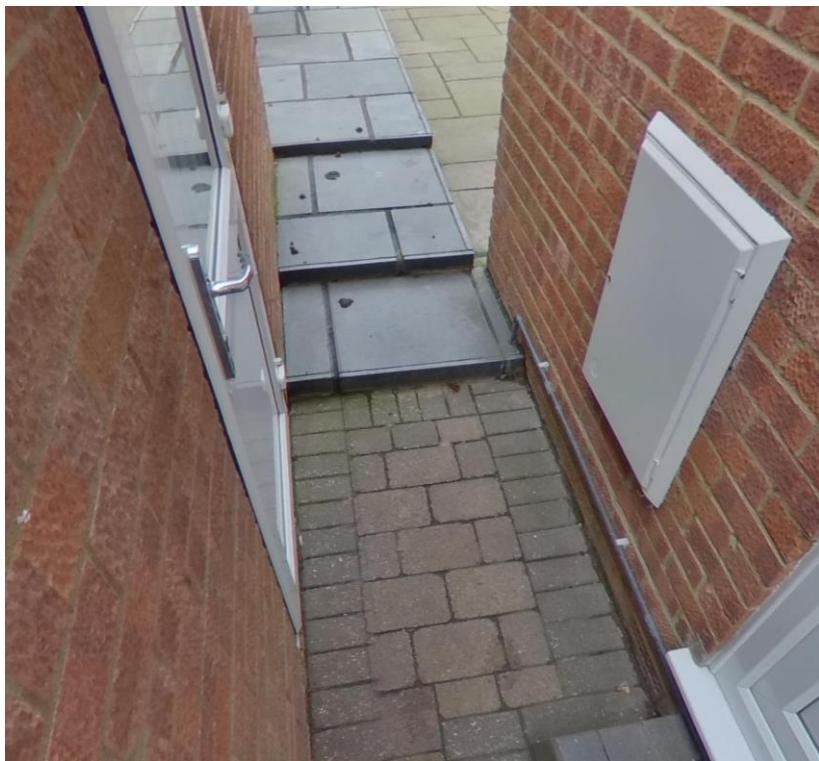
Image taken of existing gap between house and garage where new infill side extension will be located.
